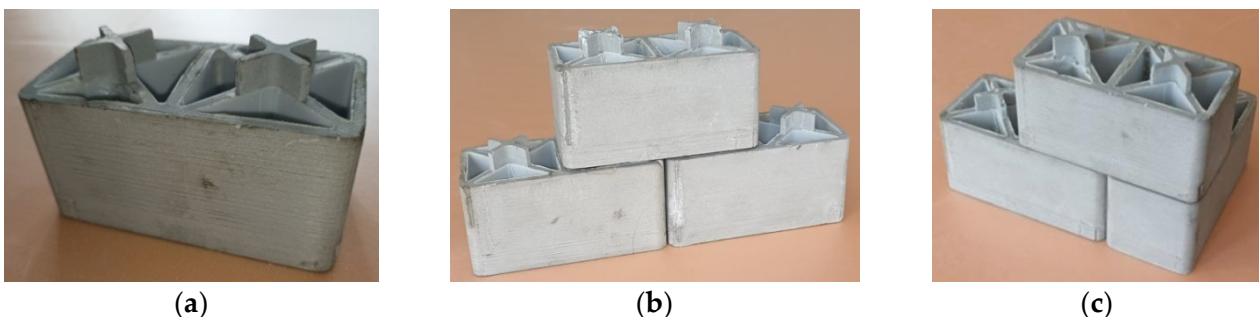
Hollow concrete blocks connected with a “Lego block-type” principle: (a)—products with a connection system based on the “Lego block-type” principle; (b)—assembling blocks into a linear structure; (c)—assembling blocks into an angular structure.
